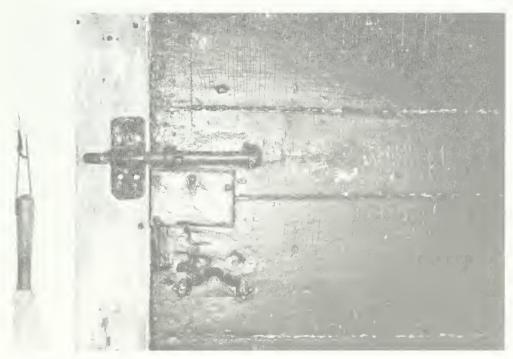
Kitchen (Room 105), north wall, detail of doorway D105 hardware.
